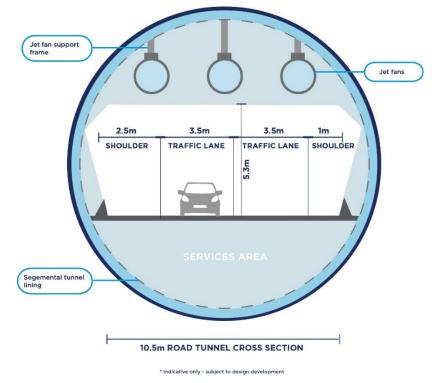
Typical jet fan arrangement (portal and ventilation outlet options)
